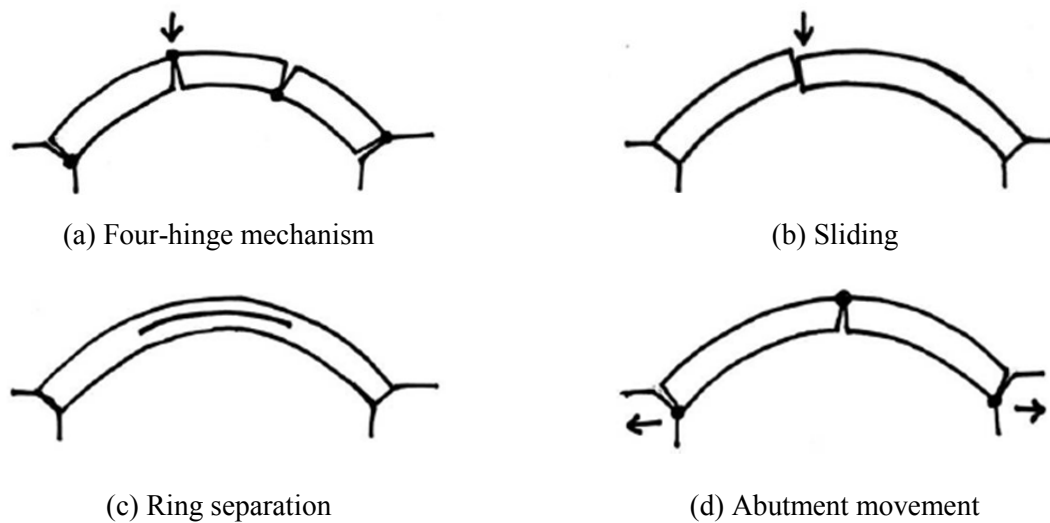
Failure modes for masonry arches (Melbourne et al., 2007)
